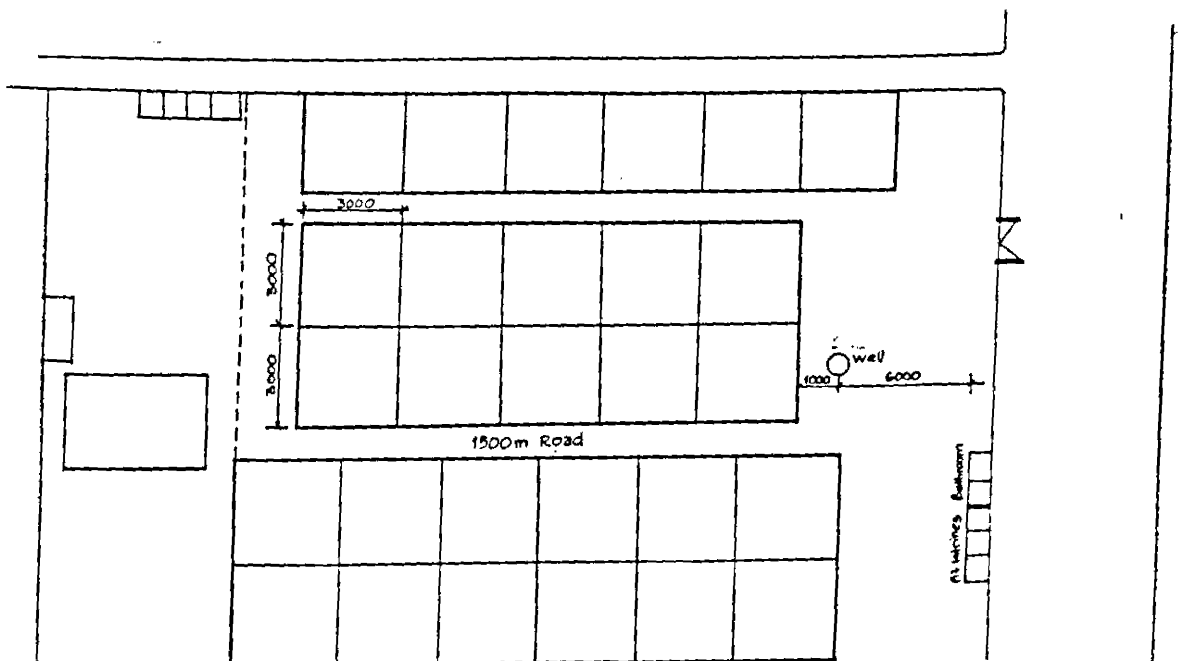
TYPICAL PLOT LAYOUT - KINYANJUI
